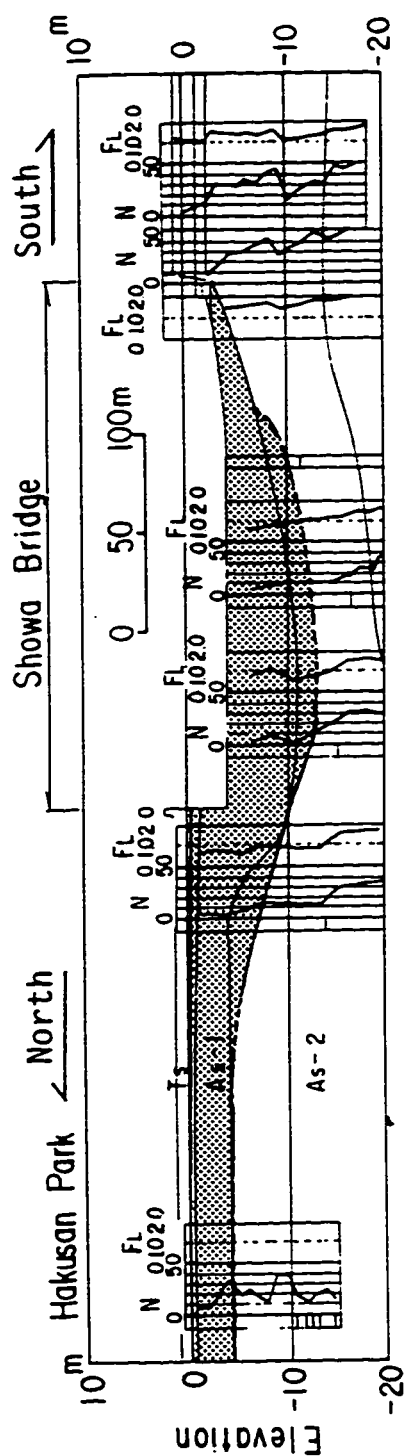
Geotechnical setting at the Showa Bridge site (adapted from Hamada, 1992)
